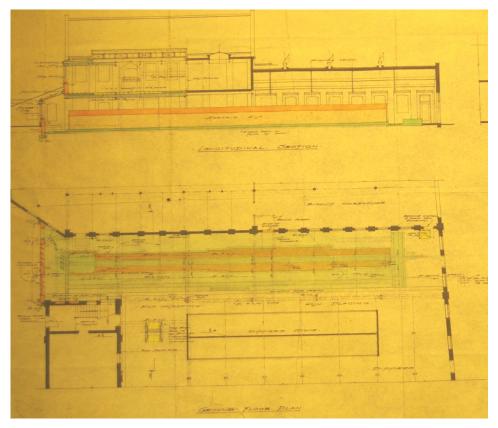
Building O section plans. Top: showing the kiln (red) with the extension to Building M above it with its flat roof. Bottom: Building R (bottom left) and S to the right of it. The dumb waiter lay in the glazed area between.²¹
